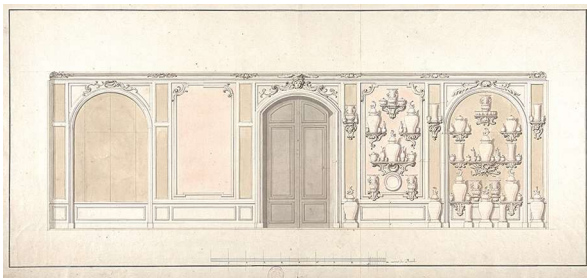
The room's north wall with fabric-covered panels to the right and left of the door and mirrors at the sides.
